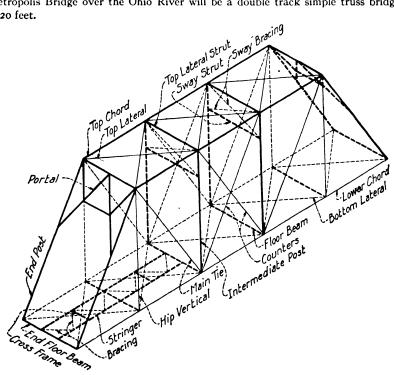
Diagrammatic Sketch of a Railway Truss Bridge.
